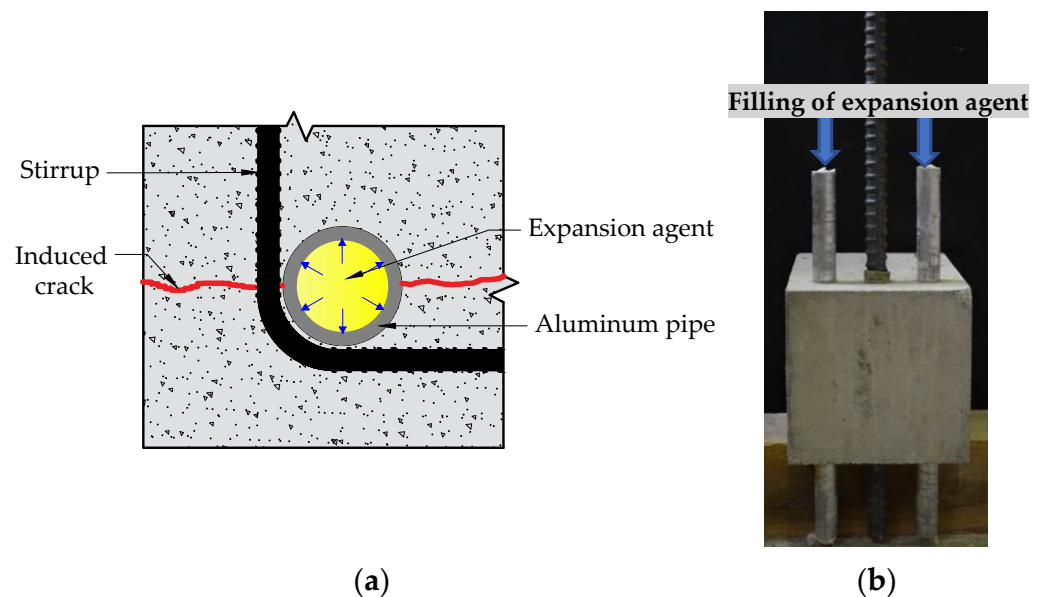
Concrete cracking with an EAFP: (a) cracking process; (b) expansion agent filling.
